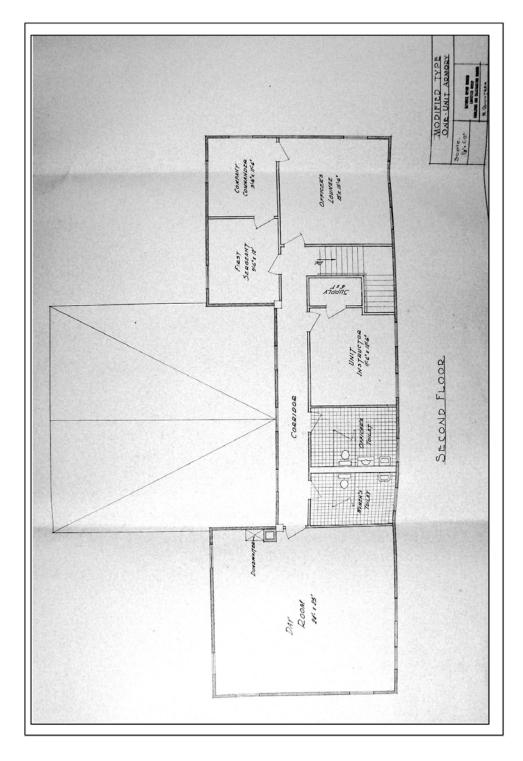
Standard Plan for an Armory developed by the National Guard with the Army Corps of Engineers, 1948 (courtesy of the National Archives II, College Park, MD, Army-National Guard Bureau Decimal File, 1946-1948, RG 68).
